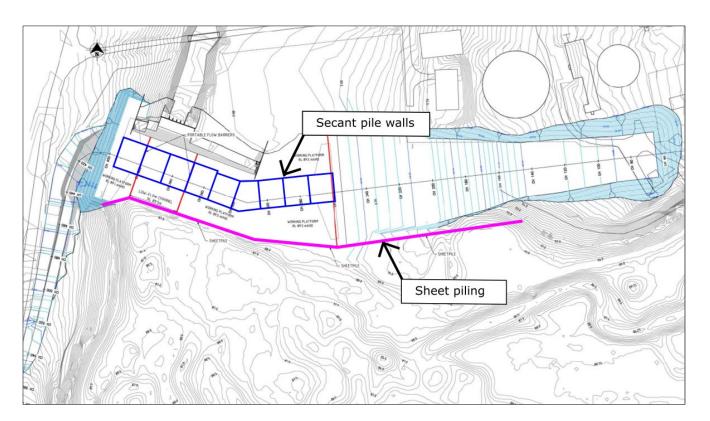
Location of Piling Works for Six Mile Creek Dam Upgrade
